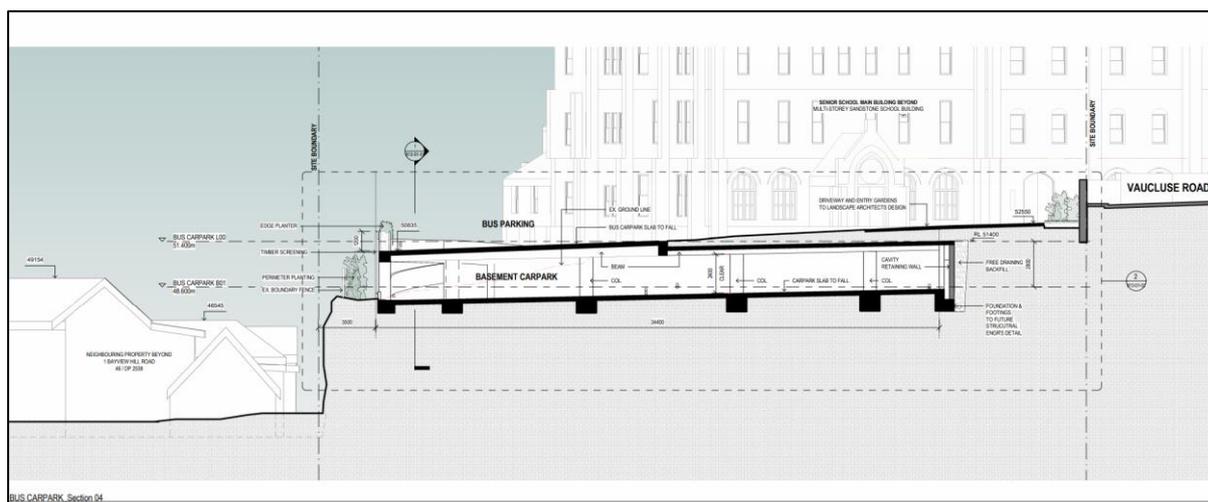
| Proposed car and bus park section (Source: Applicant's RtS 2021)
